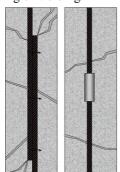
Reinforcing bar lap splice, on left, and reinforcing bar rebar coupler, on right, in
